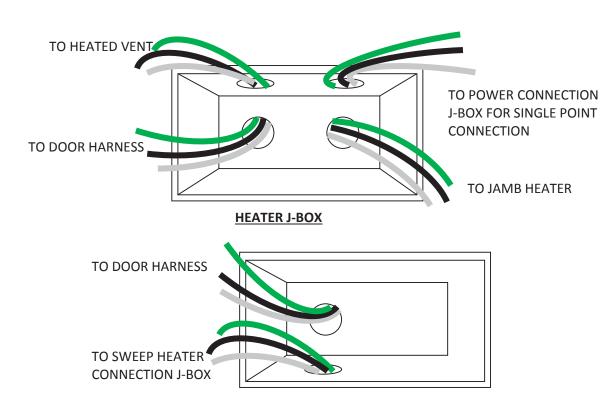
CONDUIT AND J-BOX PLACEMENT SINGLE POINT CONNECTION
